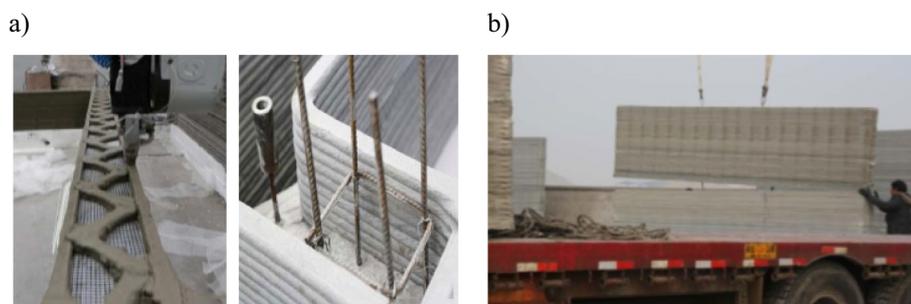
a) Printing process, b) Transport and assembly of printed components [88].
